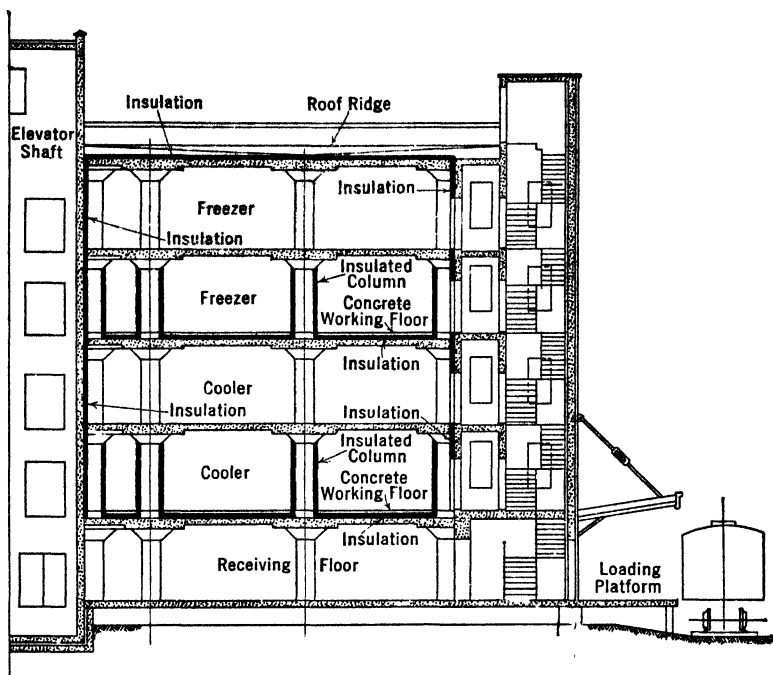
Section of a cold storage building, curtain wall construction.
